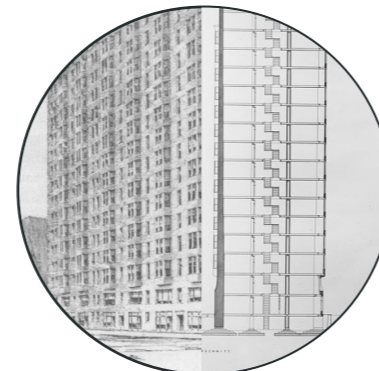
The Monadnock Building by Burnham and Root; Historic America Buildings Survey in Douglass-Jaimes, 2015 (edited by author)
